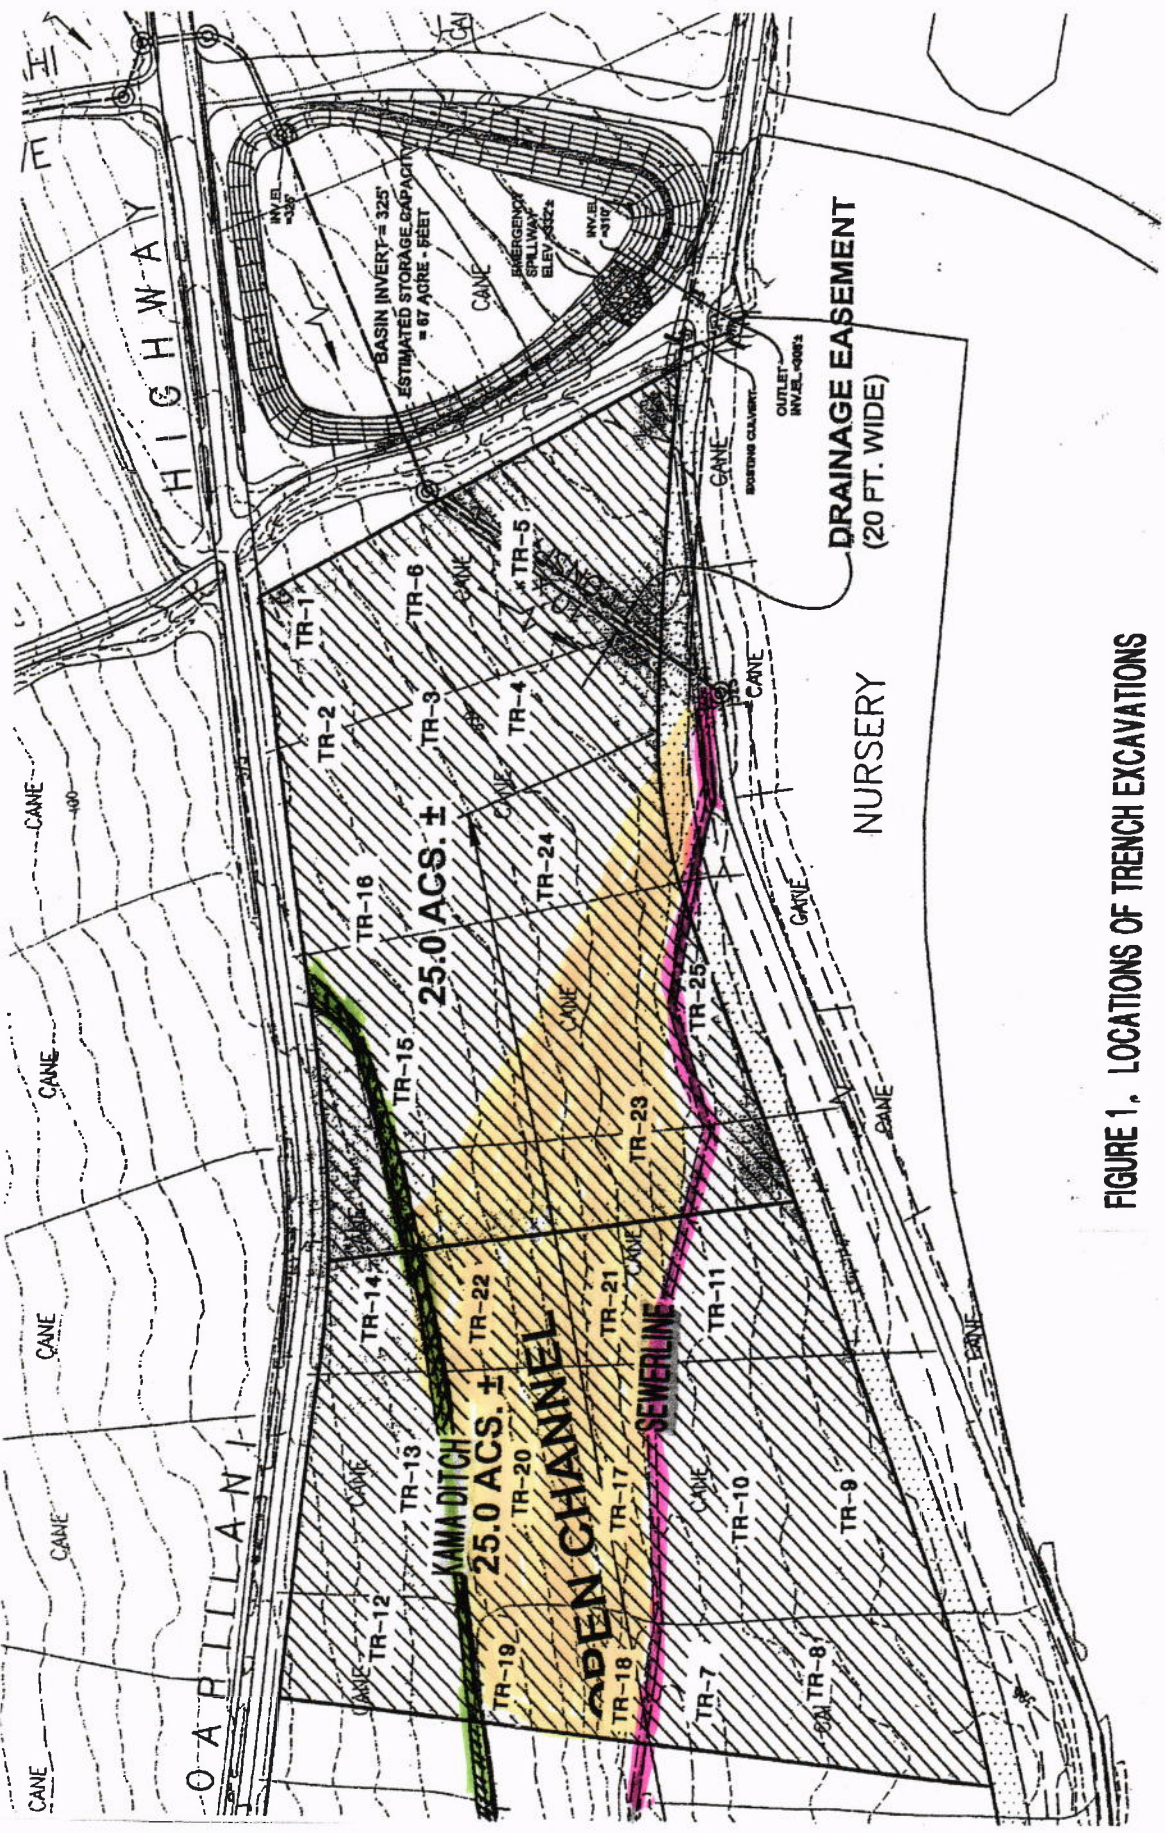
LOCATIONS OF TRENCH EXCAVATIONS
